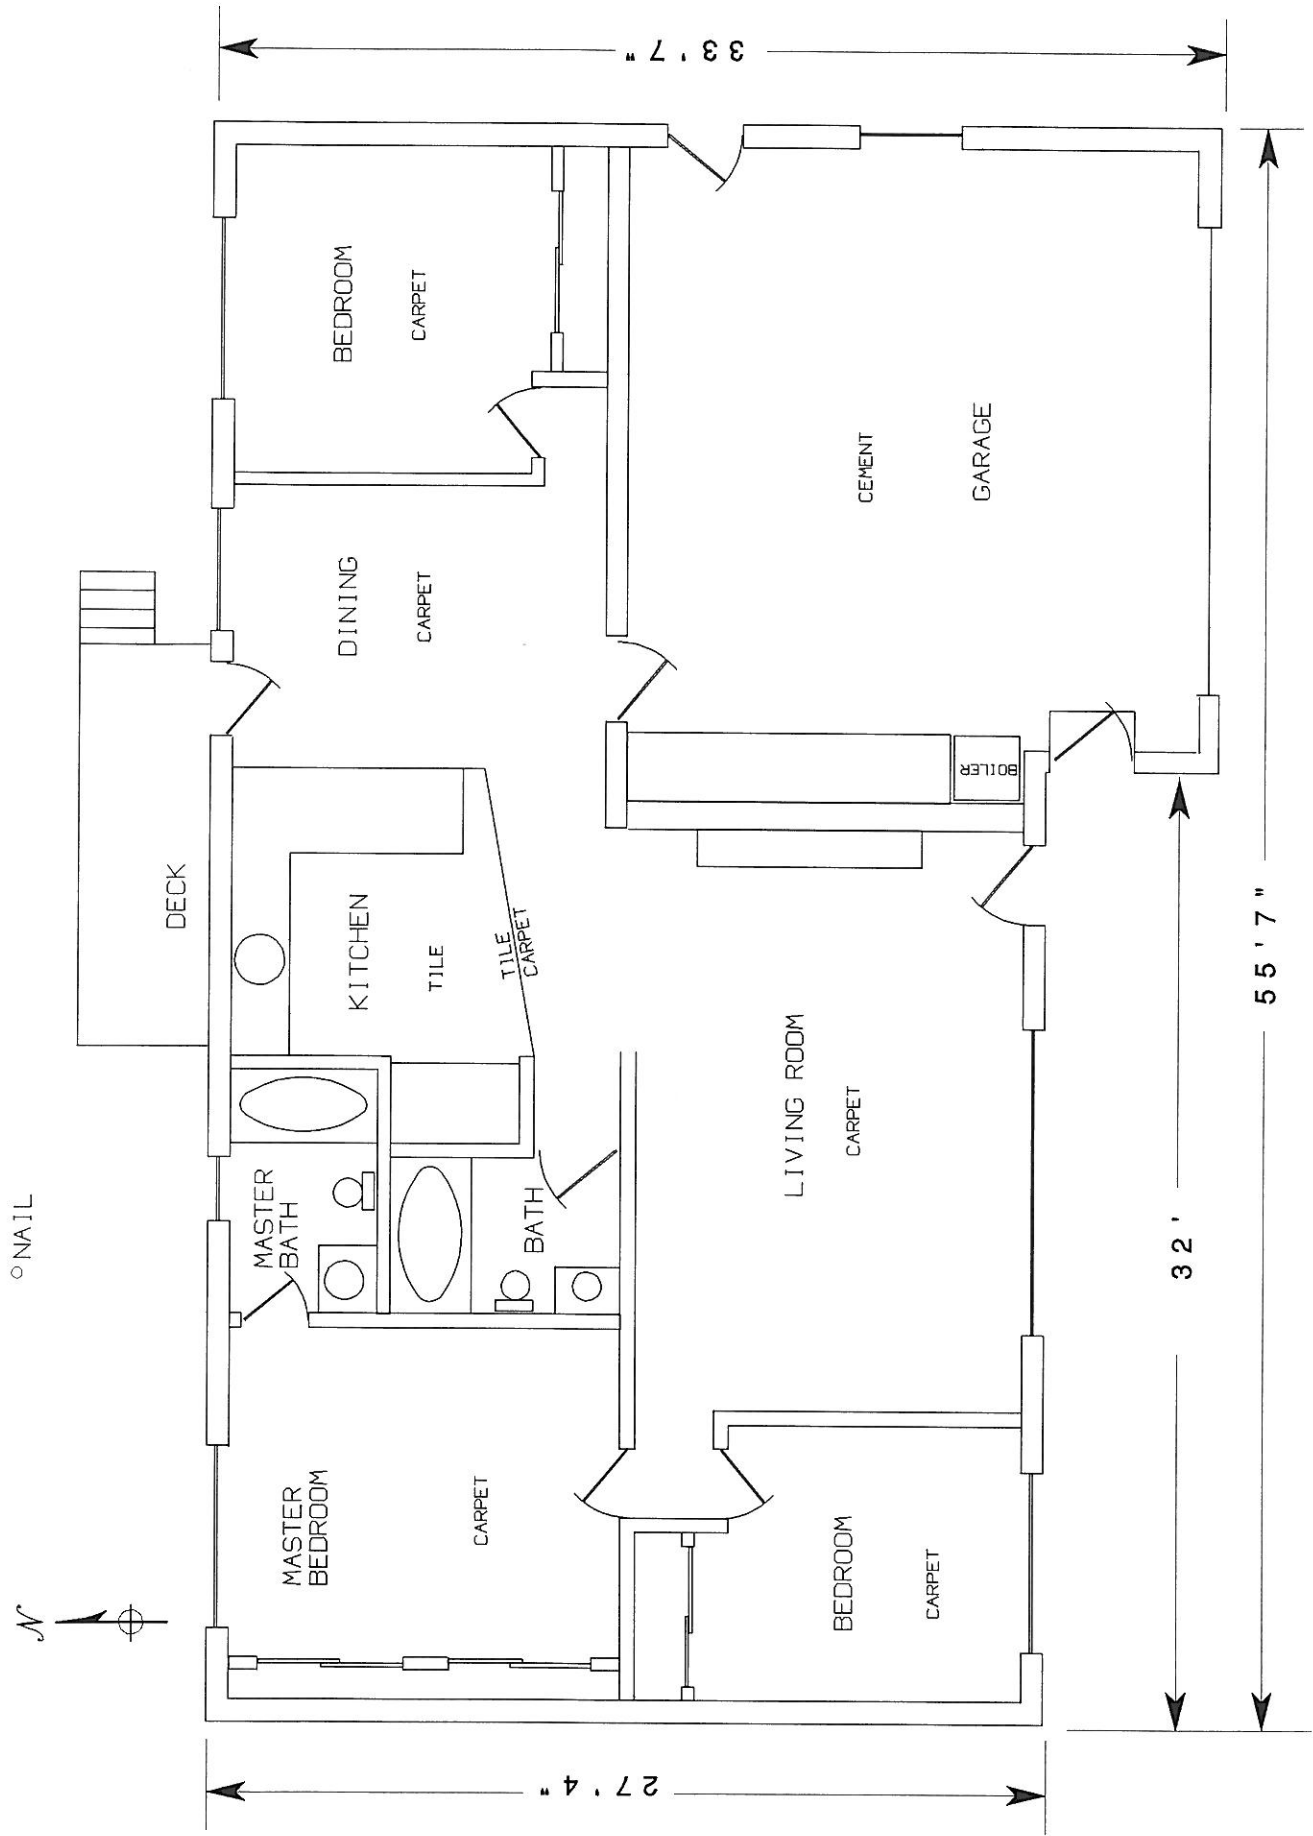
Floor Plan of 4720 STANFORD Drive
